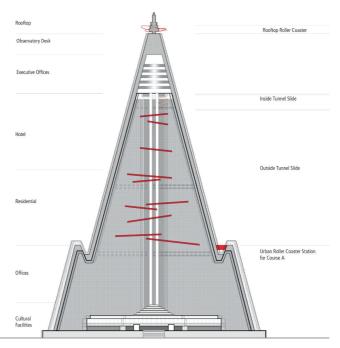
Jae Ho Lee, Ryugyong Tower, section, tunnel and slides, Pyongyang, 2050.
